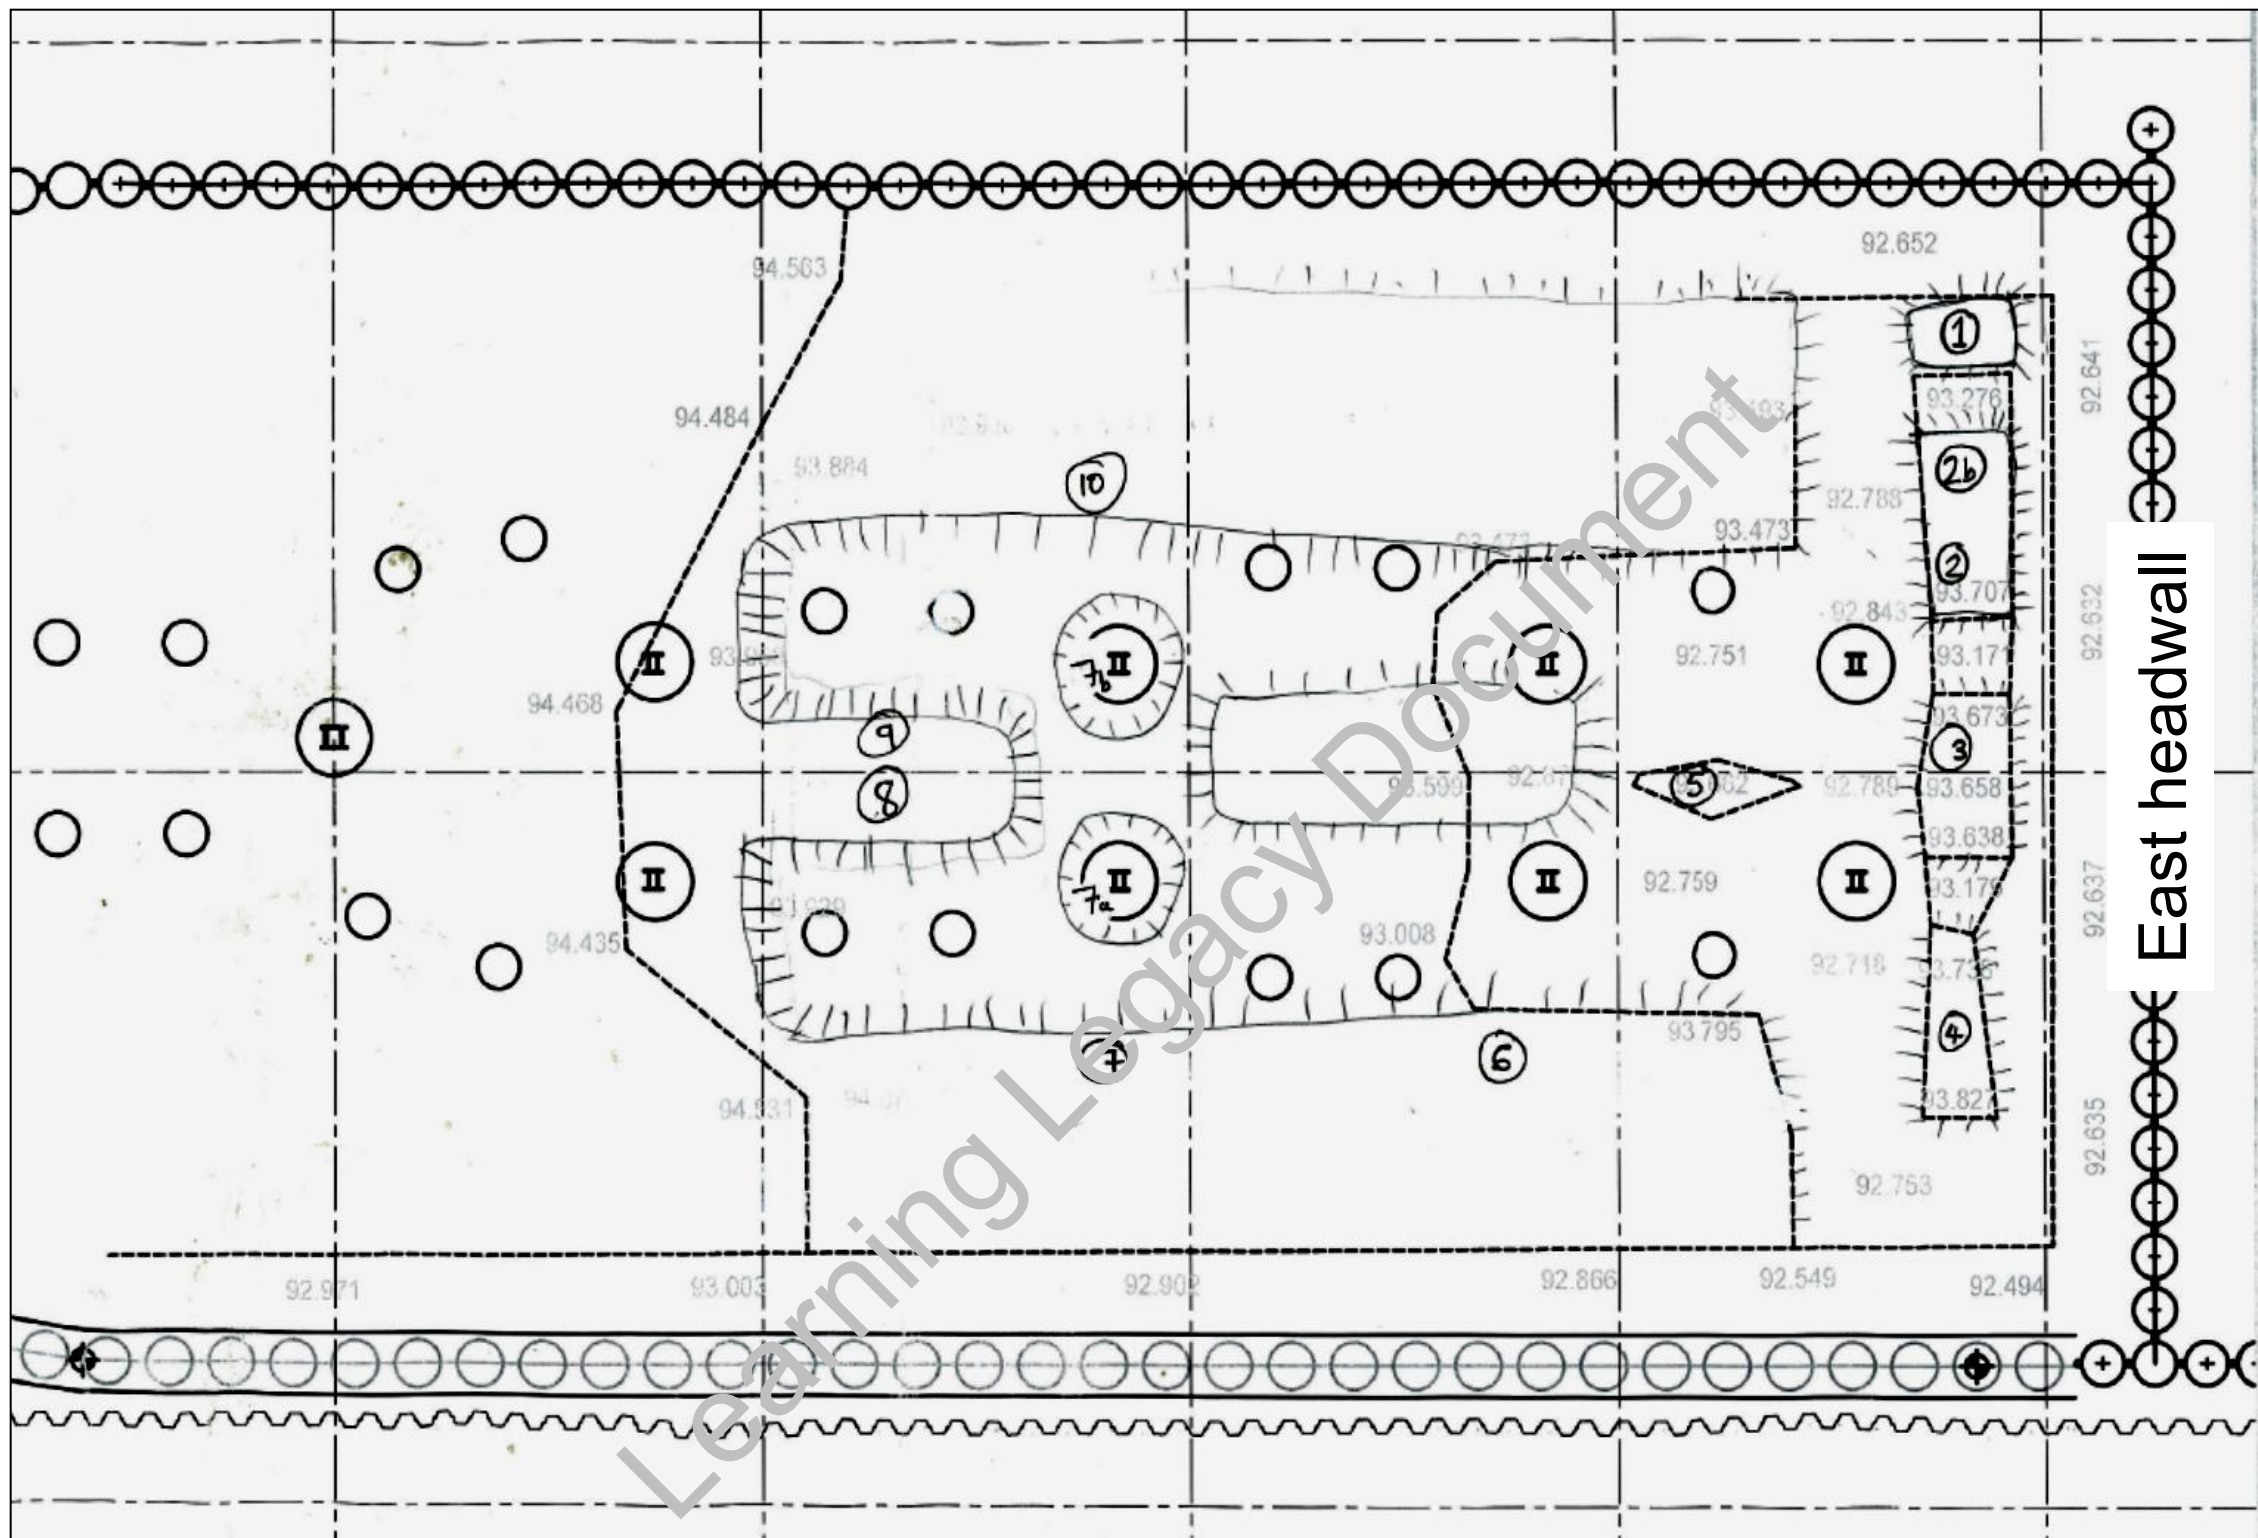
Eastern end of Canary Wharf Station Box, showing area of excavation on 22-23/07/10, showing levels of excavation in metres above tunnel datum.
